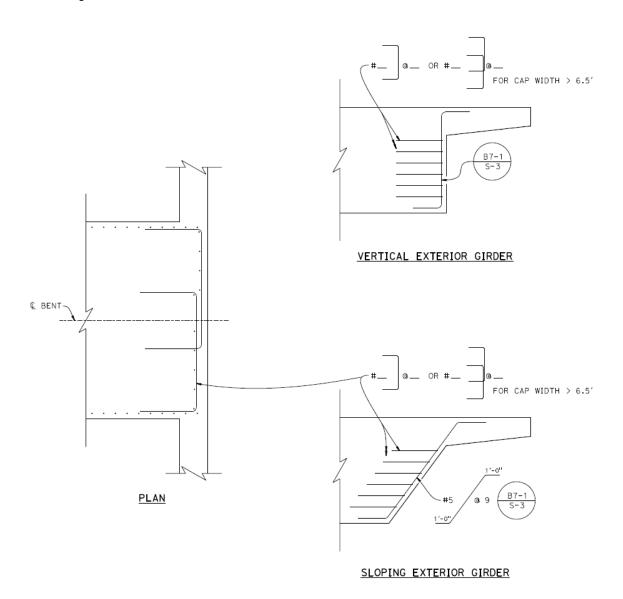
Box Girder or T-Beam Reinforcement
